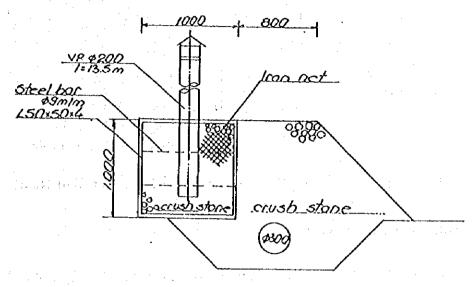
Standard Cross Section of Gas Exhaust Equipment
